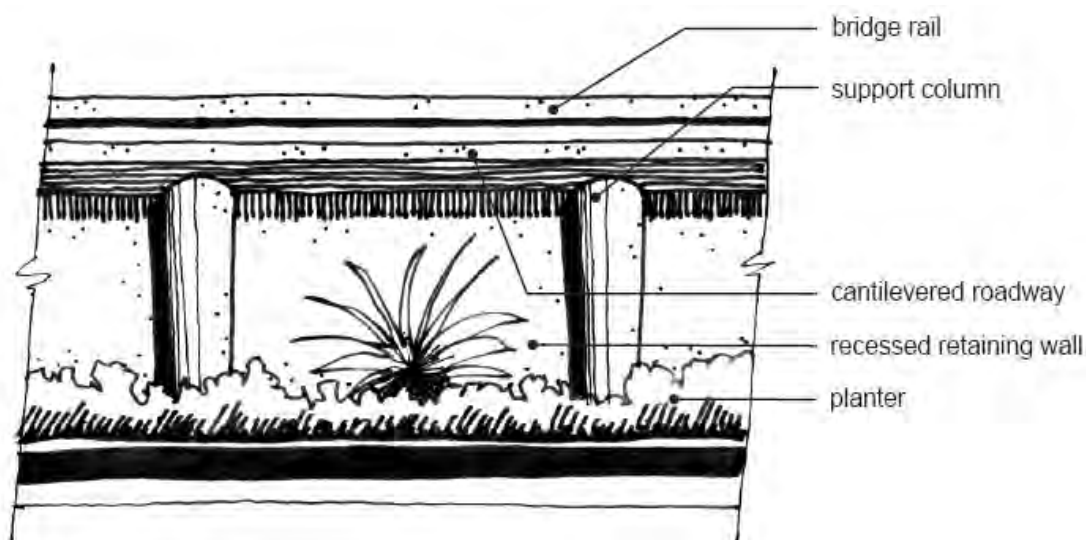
Viaduct retaining wall (Elevation View)
